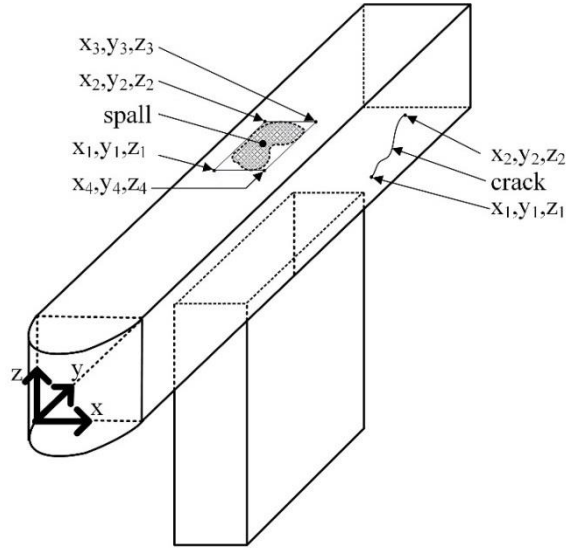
Illustration. Location of local element origin and defect coordinates on pier cap with rounded end— isometric view.
